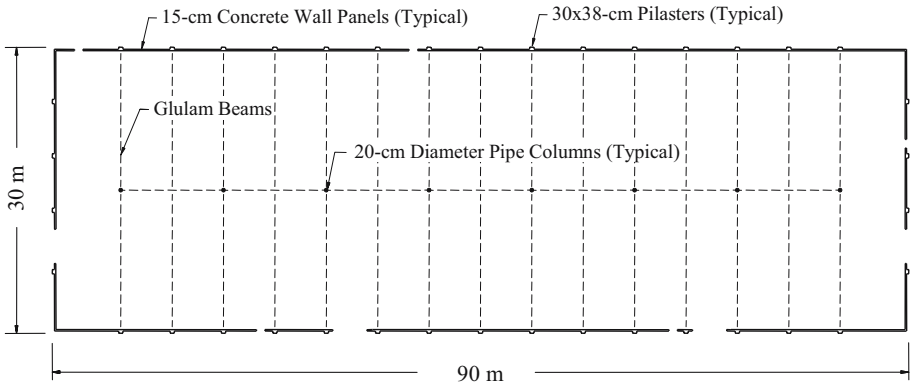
Floor plan of typical tilt-up warehouse in the western US
